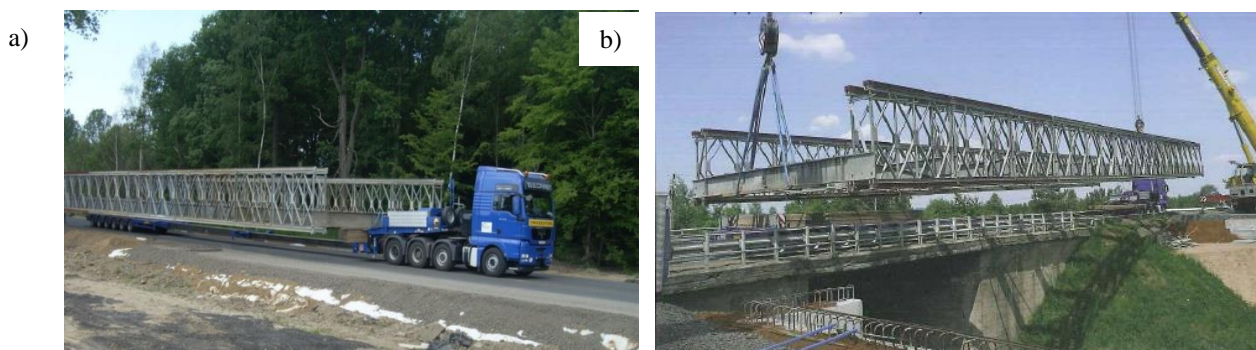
Positioning of spans delivered fully assembled, (a) transport of fully assembled span structure, (b) installation of structure on obstruction [14].
